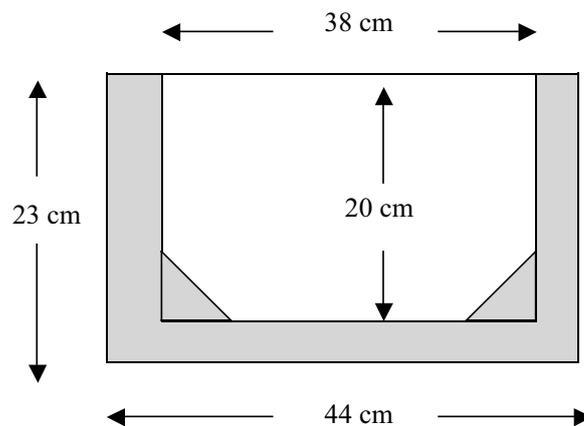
Details of the cross-section of the 9.6 m concrete drain available as 'small spoon drain section' from many concrete product manufacturers in 1.2 m lengths. From Molony (2002c).
